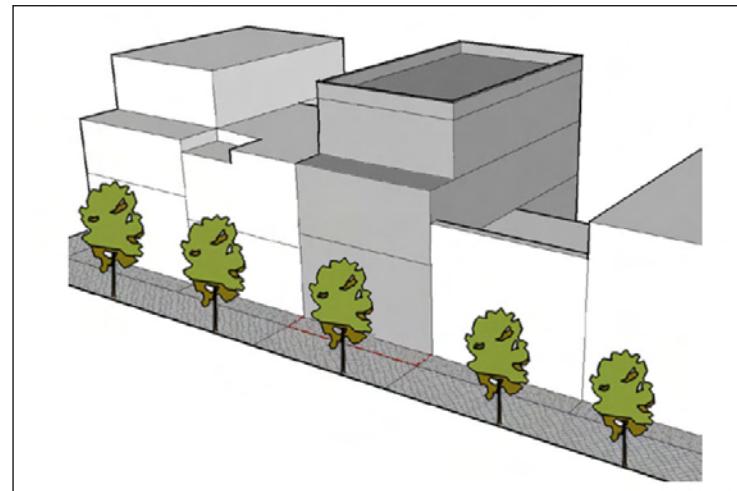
Where neighboring buildings are three stories or lower in height, newer taller buildings should consider matching lower facades to those of adjoining lower buildings with upper floors set back.
